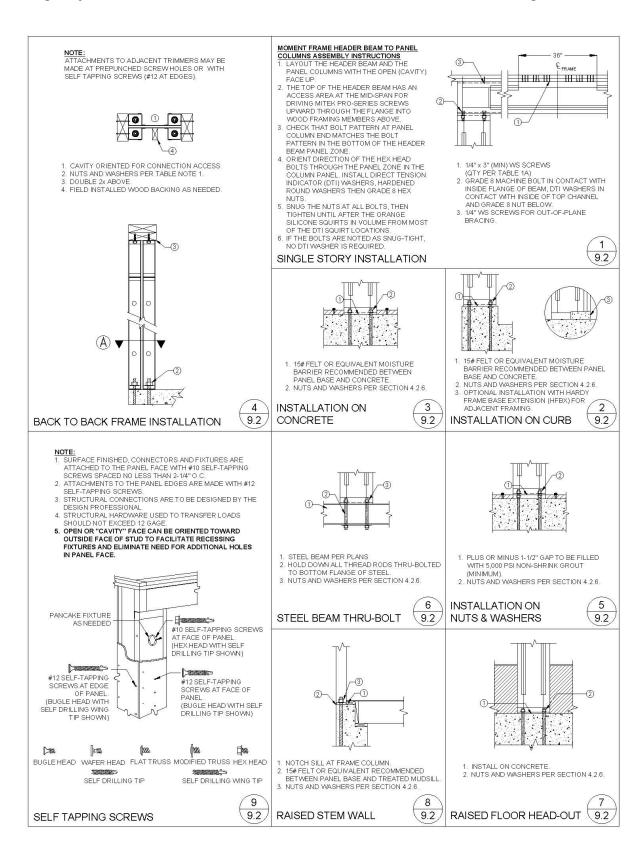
PORTAL FRAME INSTALLATION DETAILS
